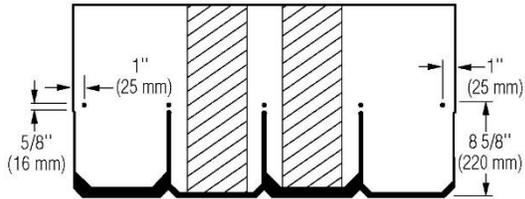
Use five nails for every full Grand Manor Shingle, Carriage House Shingle, or Centennial Slate.
